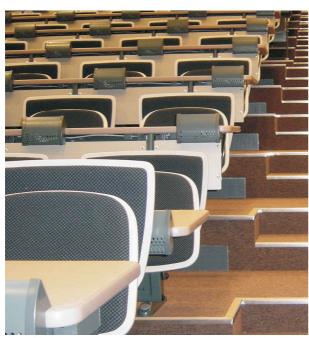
Linear step displacement outlet in the Kansai University, Osaka
